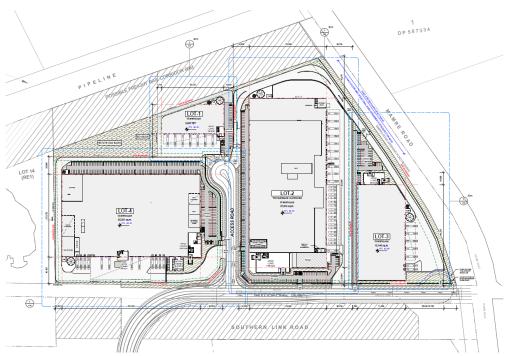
Previously exhibited layout for SSD-9522 MOD 3 – Site Layout Plan
